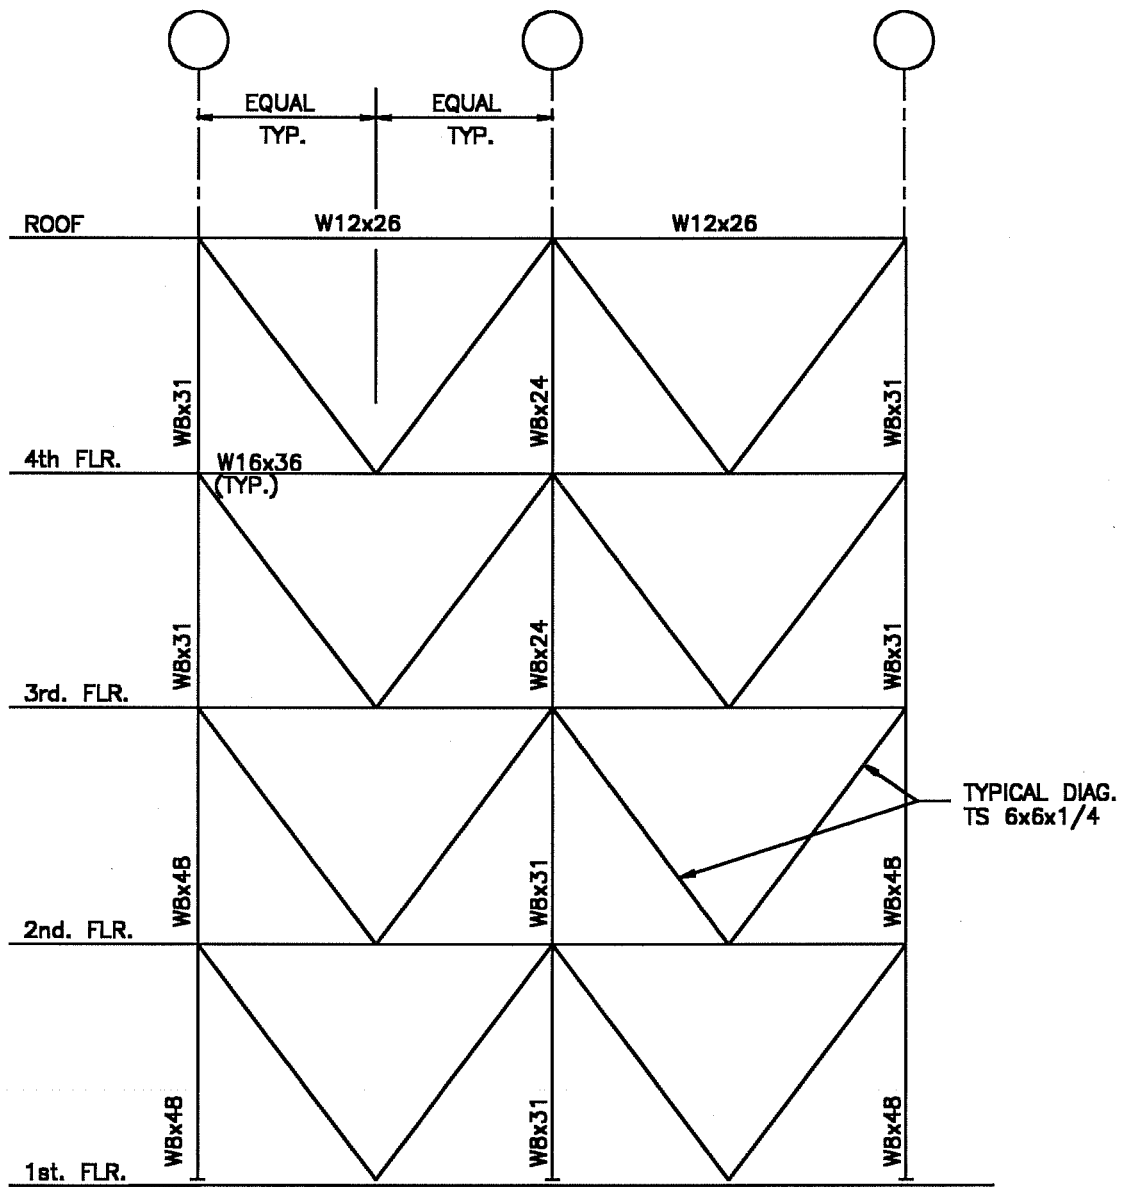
Peninsula Office Building - Typical V-Braced Frames
